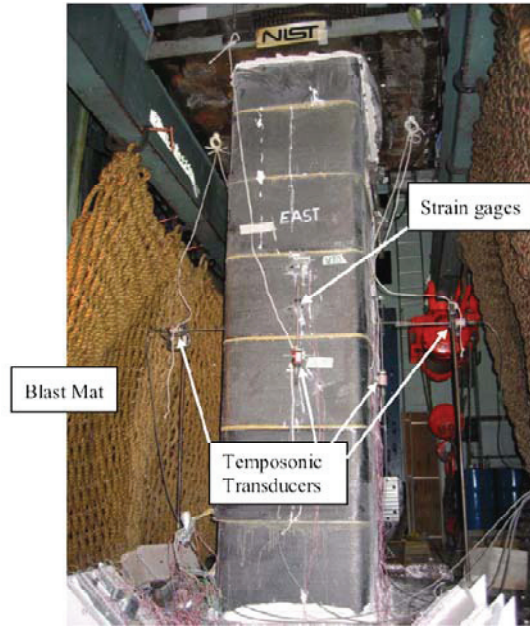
Test Setup of Specimen at NIST Laboratory.
